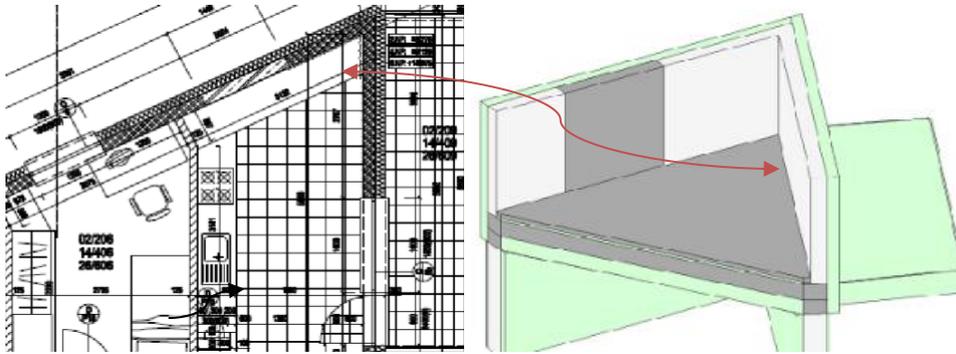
Analyzed detail of the connection of two not-orthogonal walls and the ceiling structure
